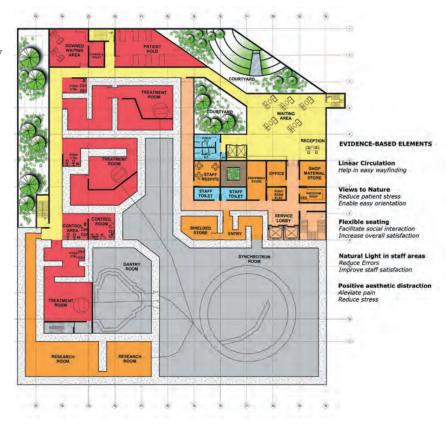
First-floor plan: Procedure and equipment areas were designed below ground level to use the earth around the building as a natural shield for radiation. The layout of the equipment room was based on the latest concept of locating the ion source and the linear accelerator within the circumference of the synchrotron ring, thereby decreasing the amount of space required. A horizontal beam treatment room, an angular room, and one with a gantry were designed to illustrate different room types.
